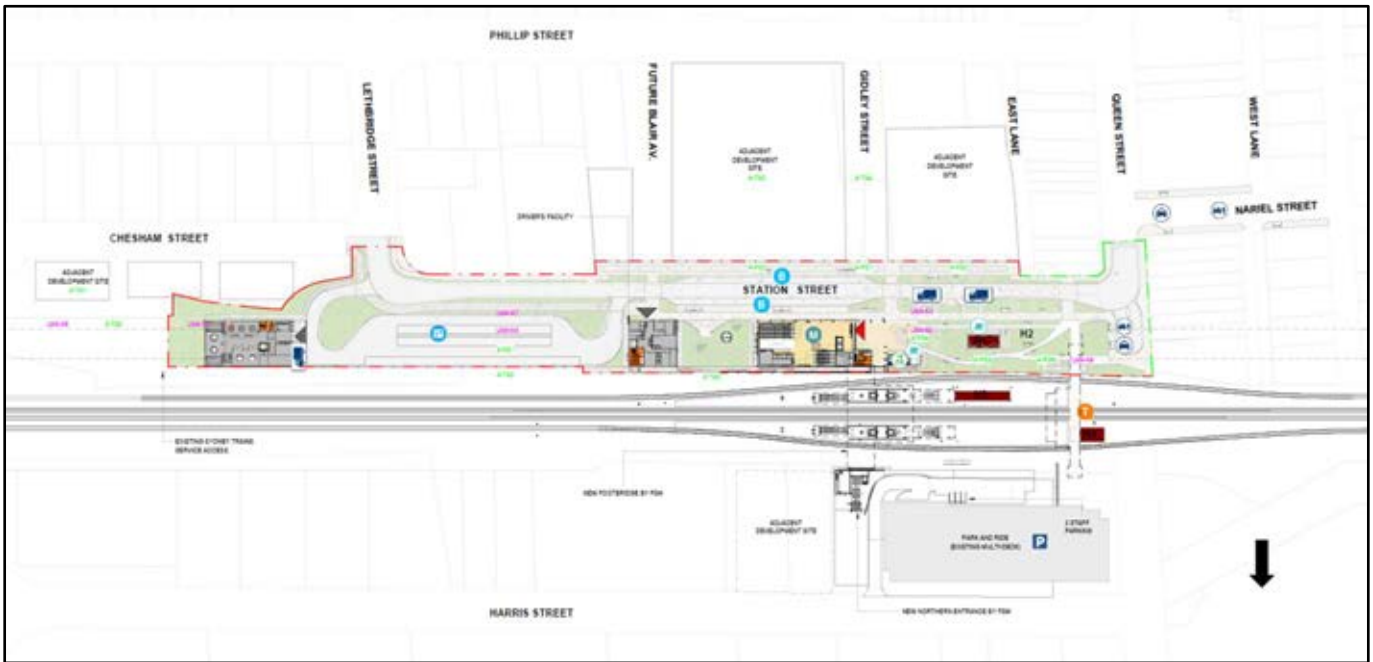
STM STATION ARCHITECTURAL (PRELIMINARY)
